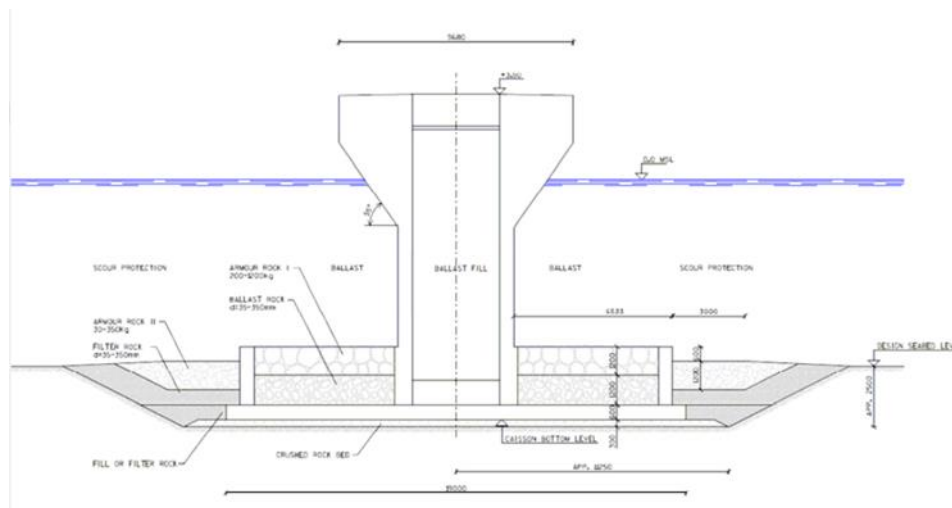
Concrete substructure cross-section (Jeppsson, Larsen, & Larsson, 2008)
